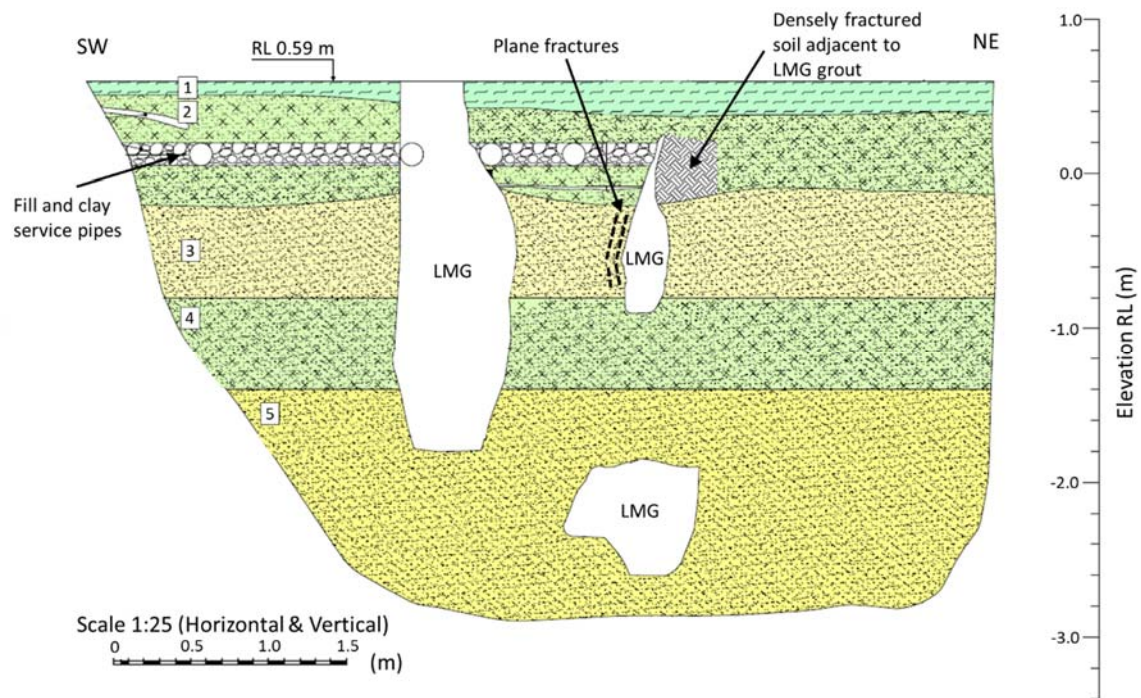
Cross-section of excavation trench at the 6-LMG-1 Test Panel. Modified from van Ballegooy et al. 2017.
